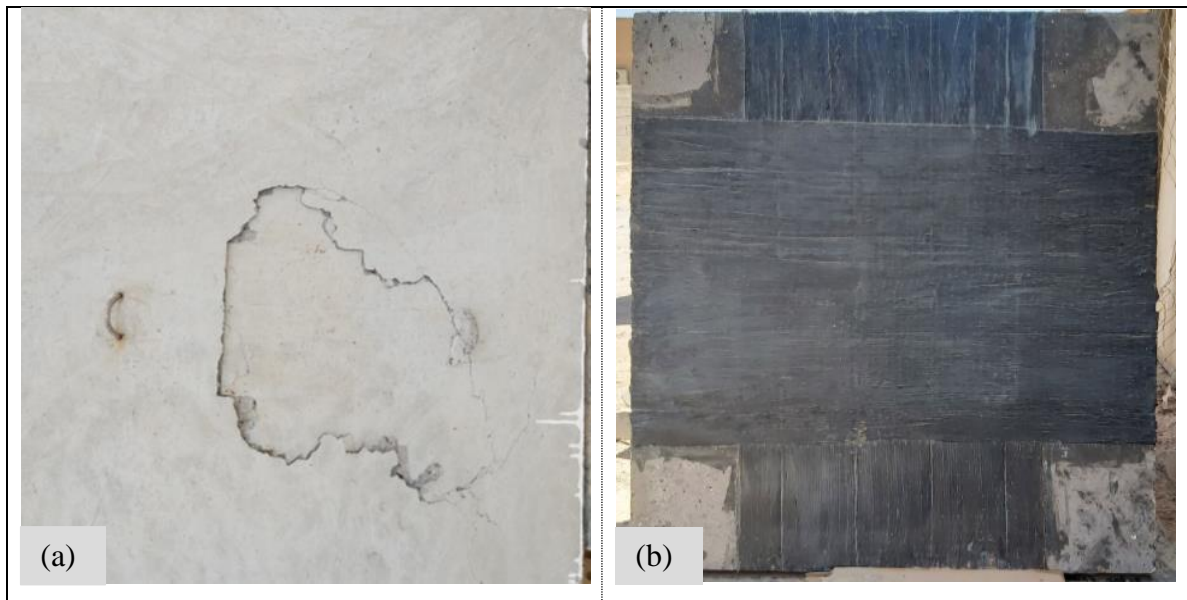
Failure pattern in slab S3, (a) tension zone, (b) compression zone.
